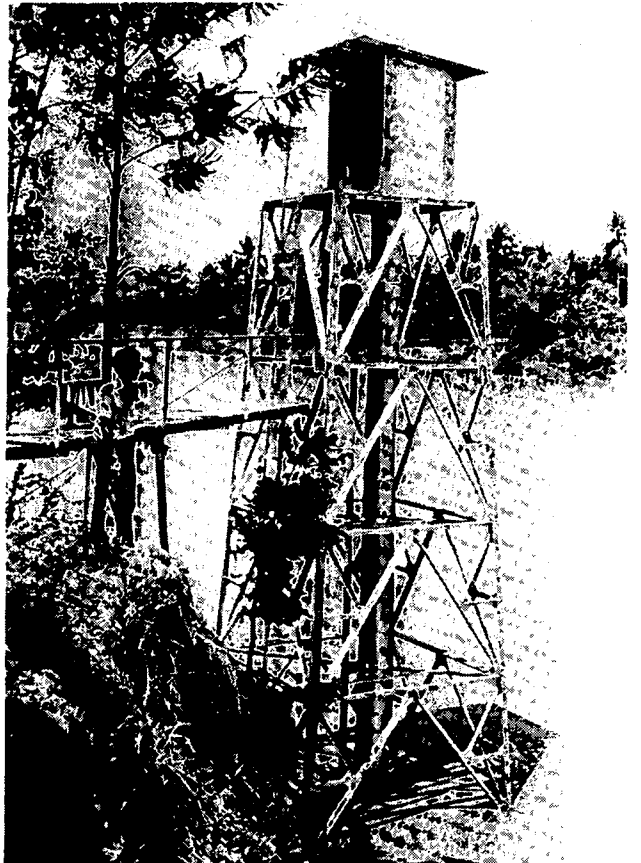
Water level recorder station; stilling well made of steel pipe, house made of sheet iron, supported by specially designed steel tower (Comal River at Comal, Java, Indonesia).
